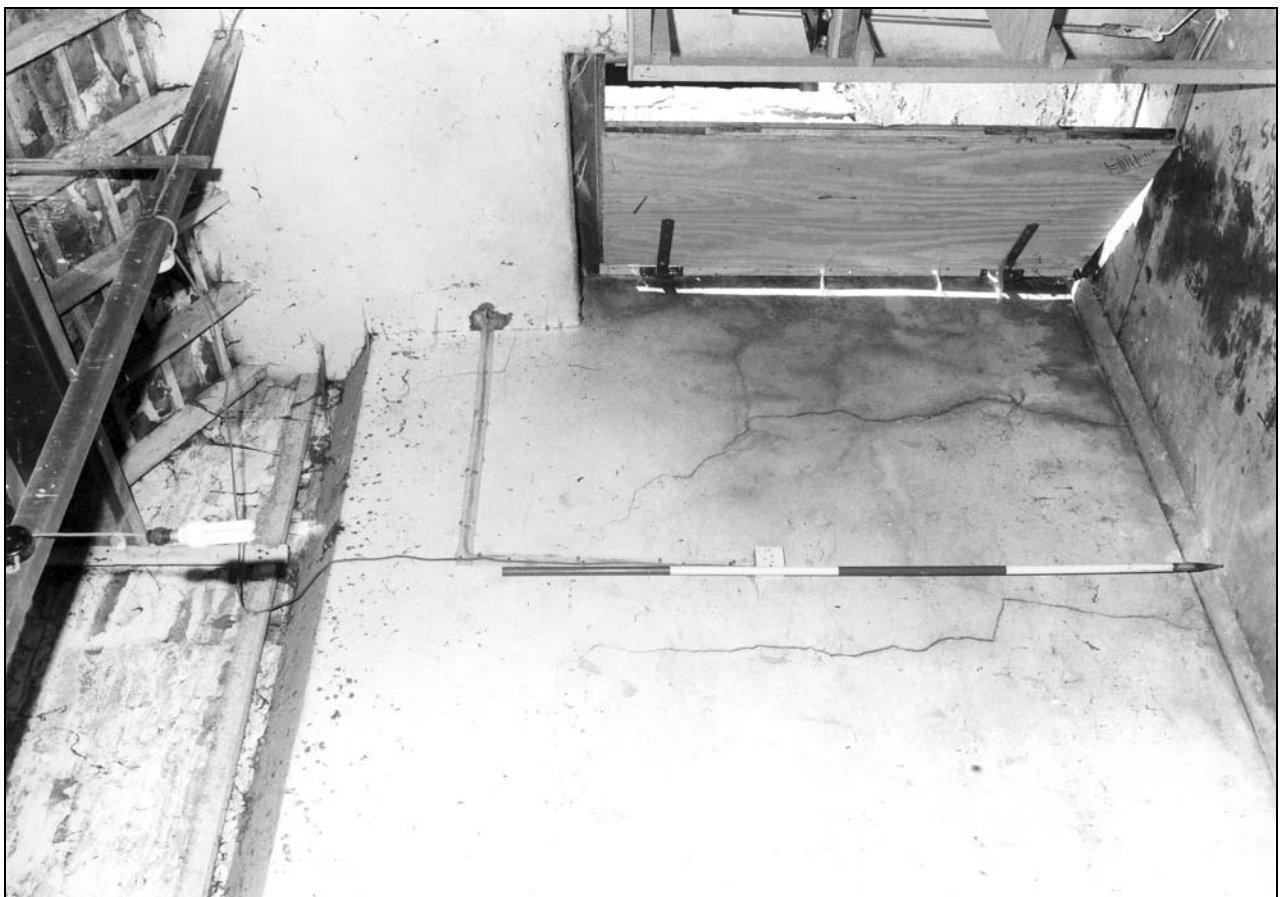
Building 2: upper ground floor, from the north-west (film 3, frame 6)
